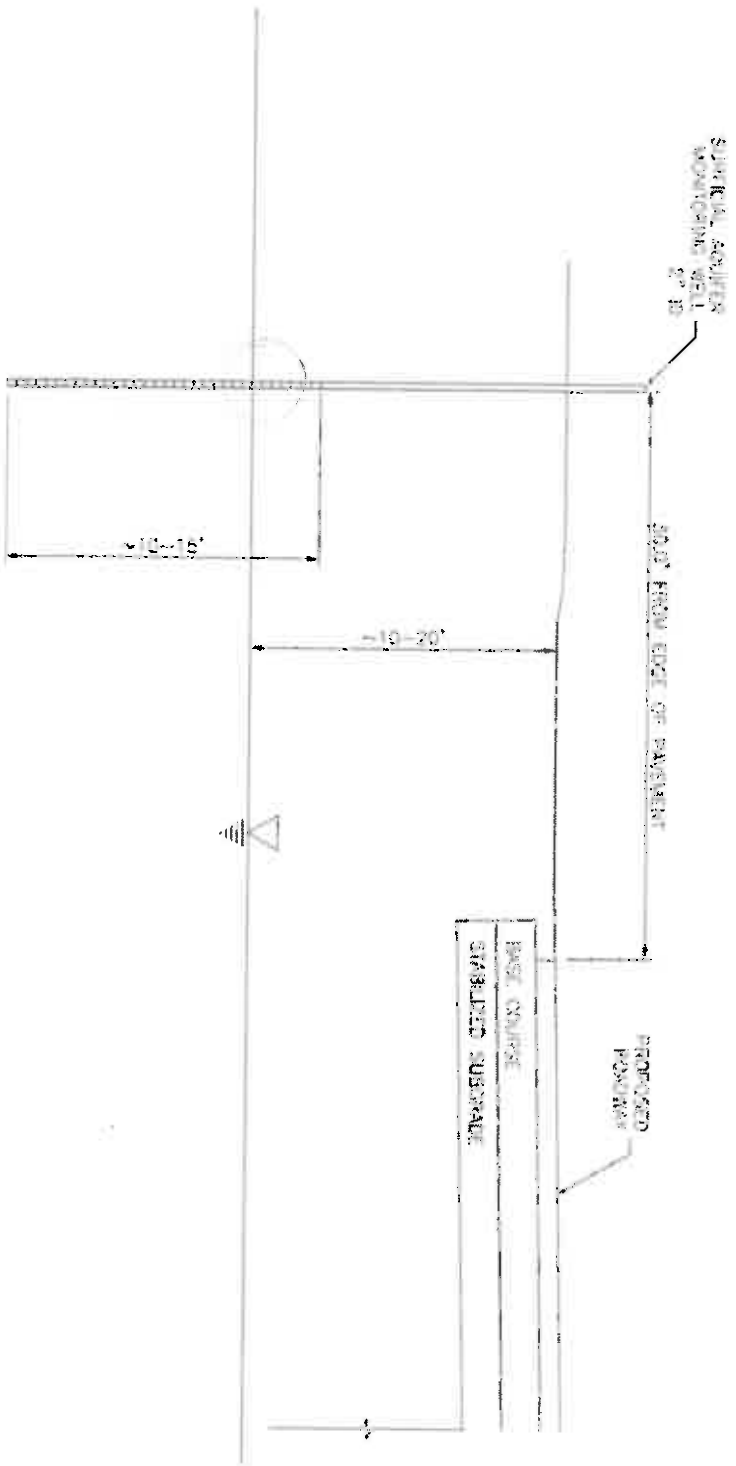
Section A-A: Typical Monitoring Well Cross-Section
